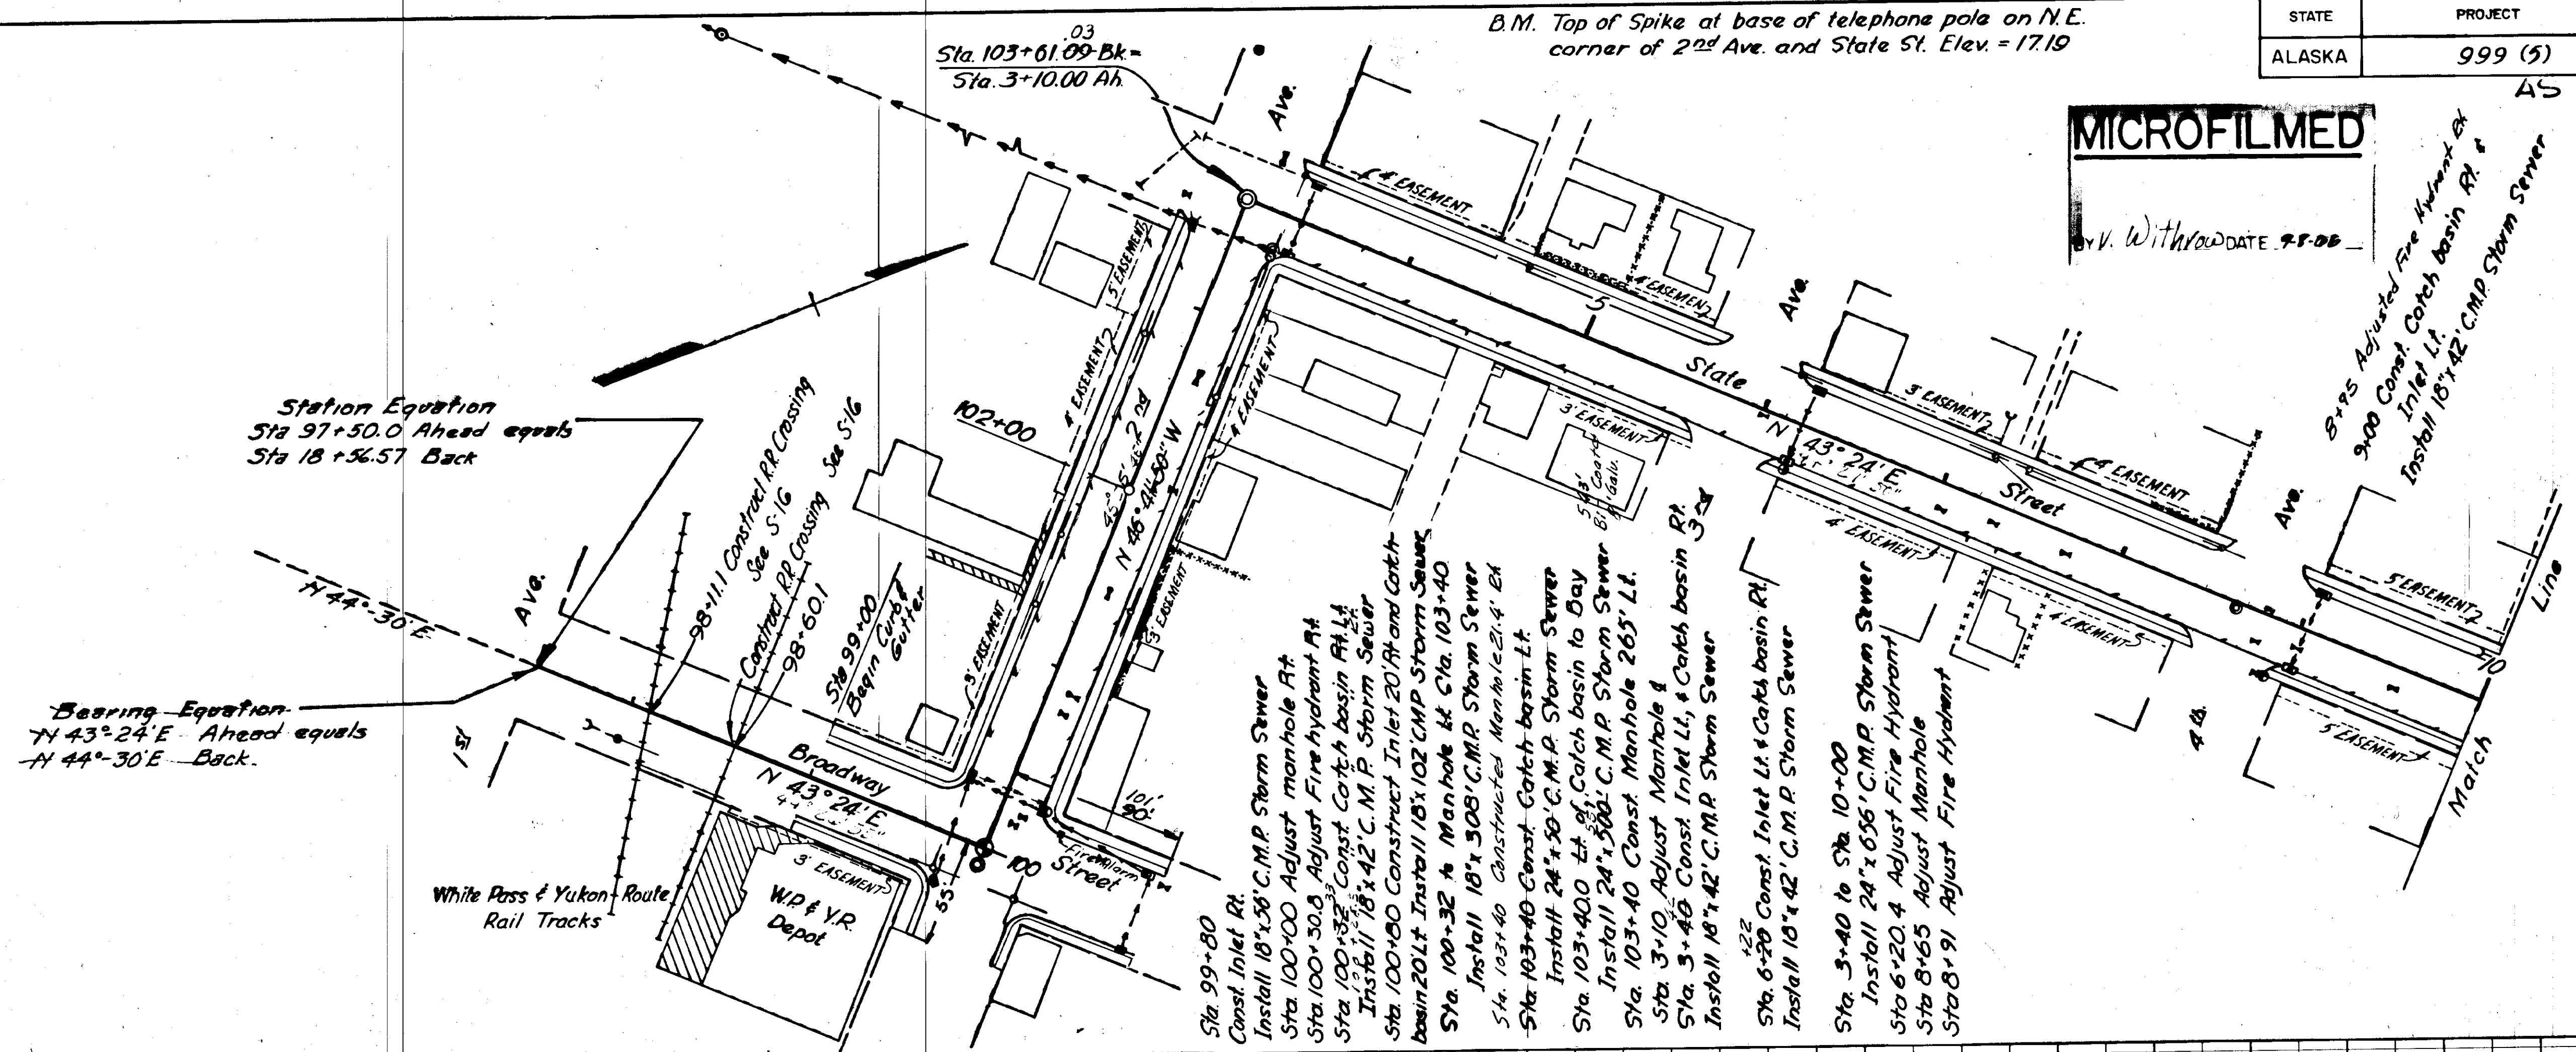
PLAN, PROFILE OF P & B & E STANDARD
